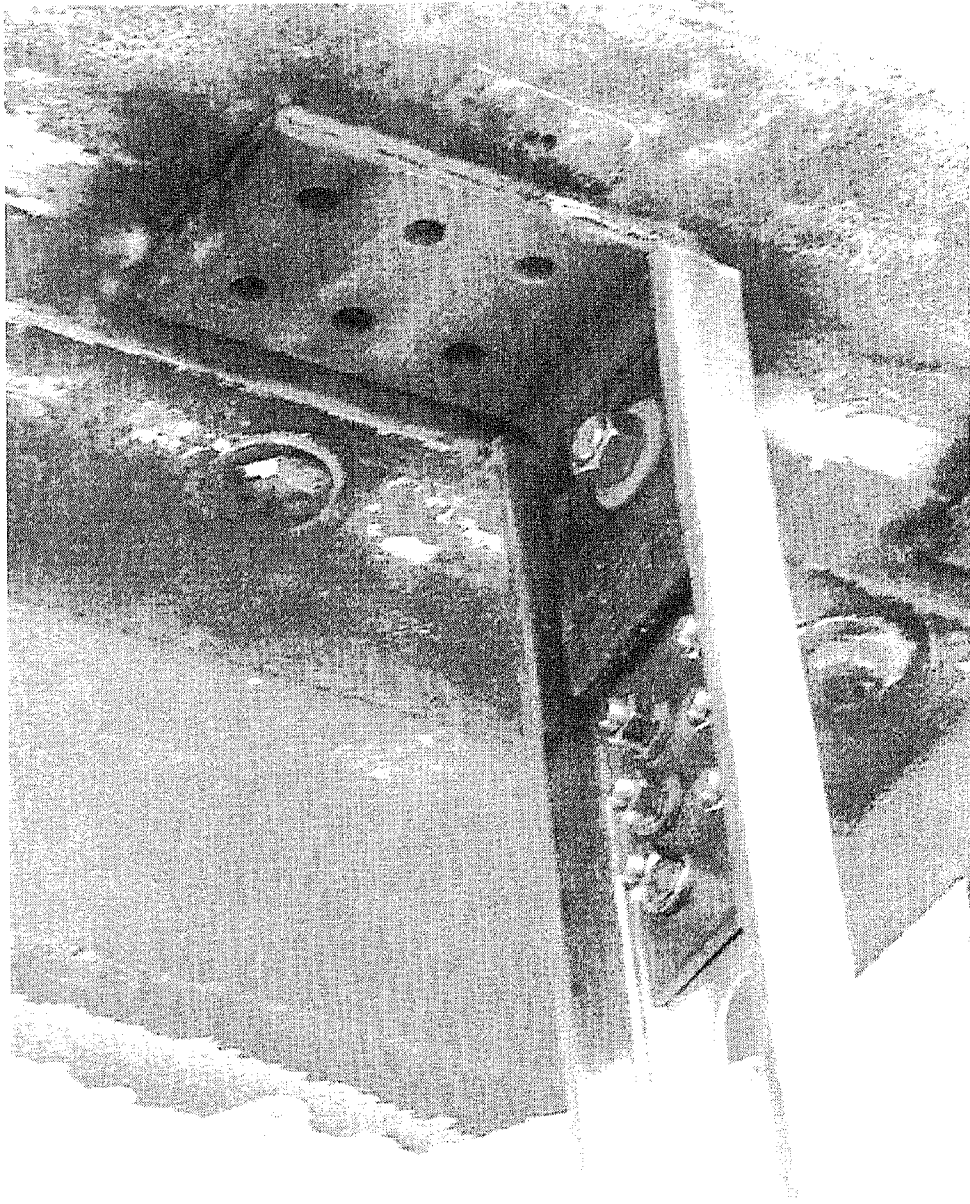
Connection Detail at the Top of the Stud (Dinan et al. 2003)
